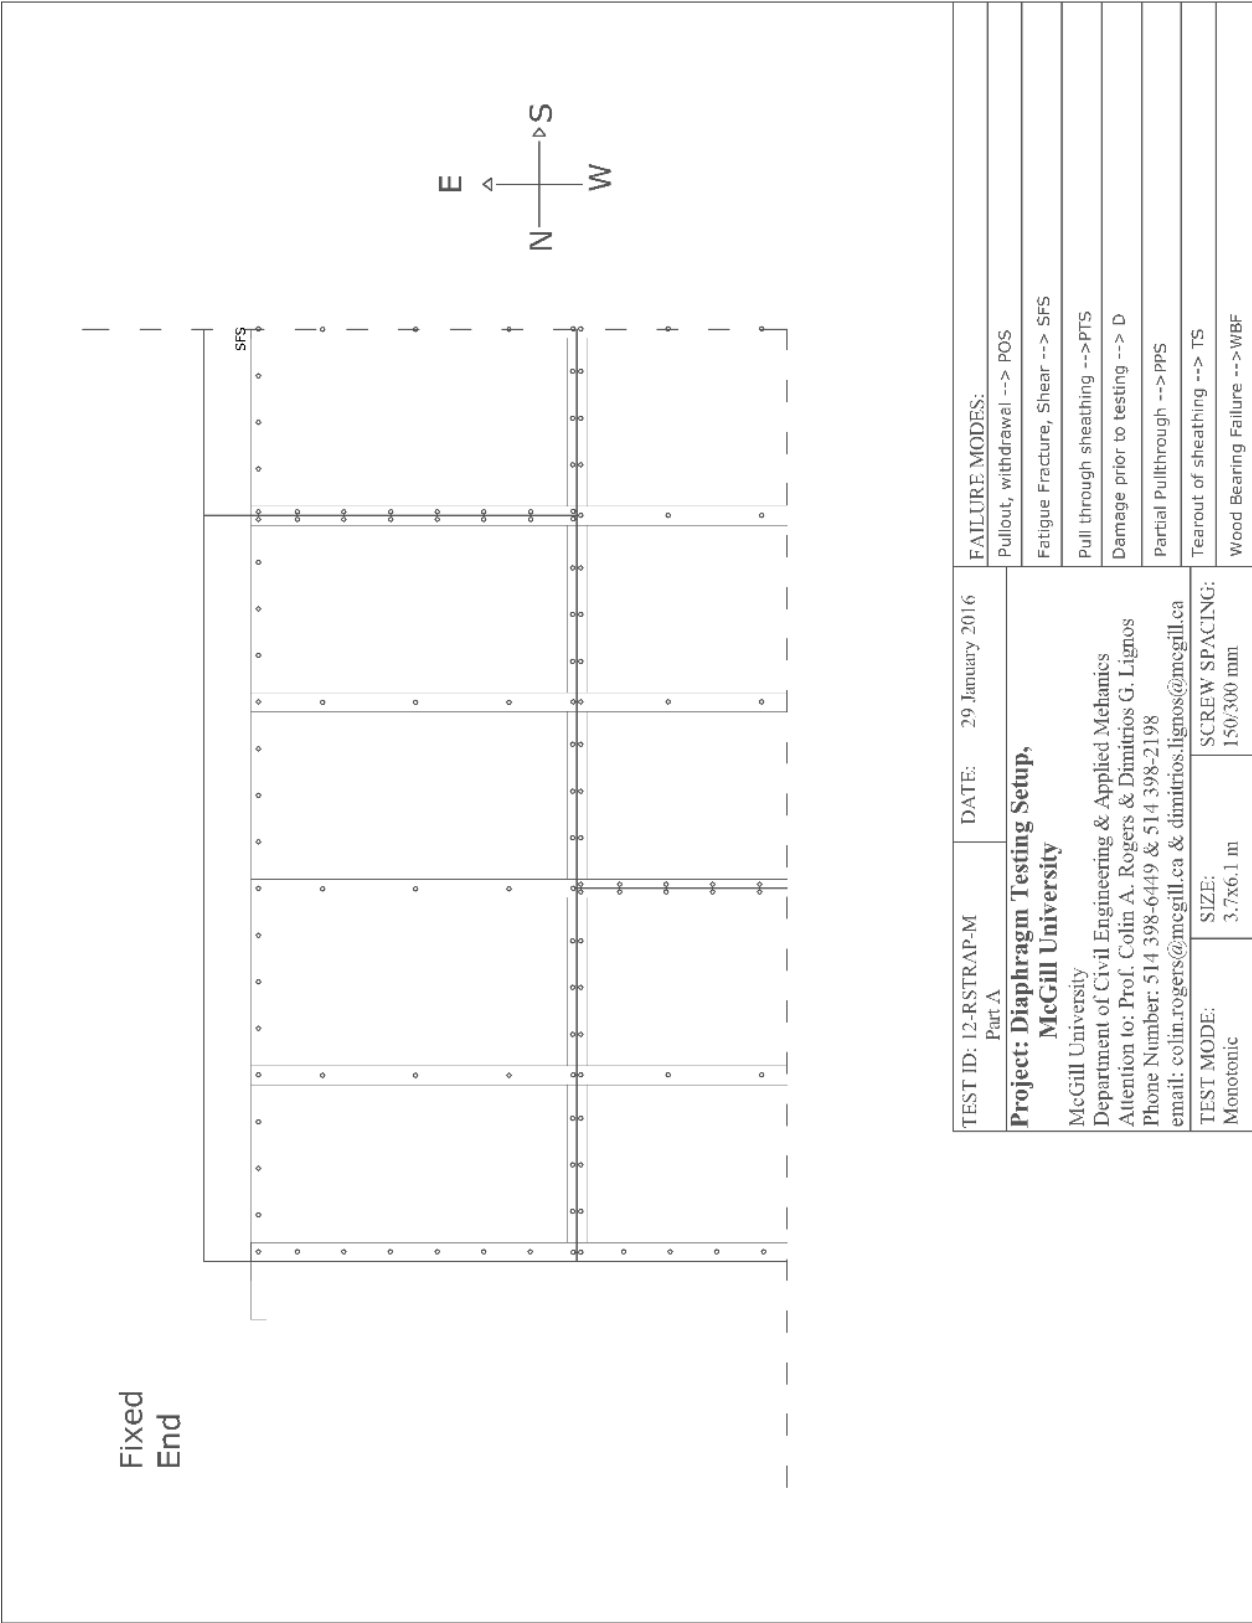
Sheathing Fastener Failure Modes Part A Specimen 12-RSTRAP-M
